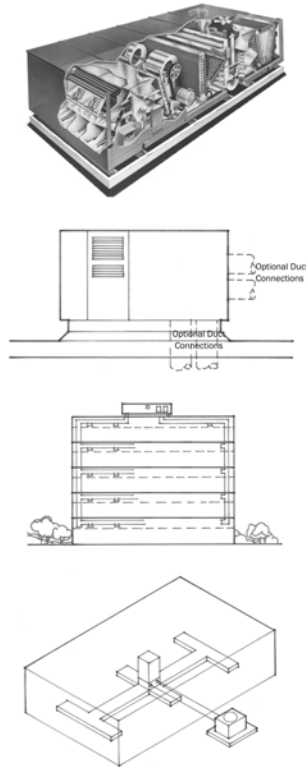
(HV1) Typical HVAC equipment and duct system layouts.
